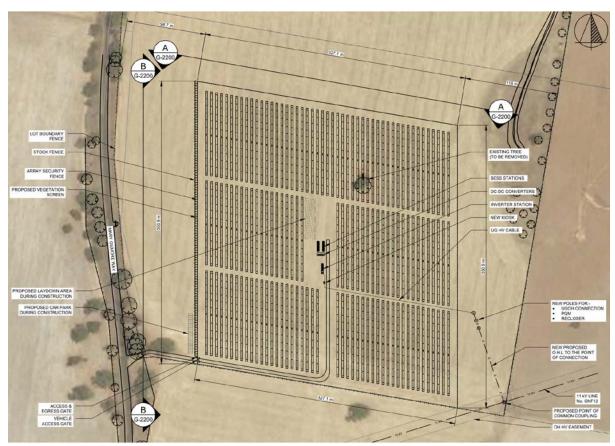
Site Plan showing location of solar farm and associated infrastructure.
